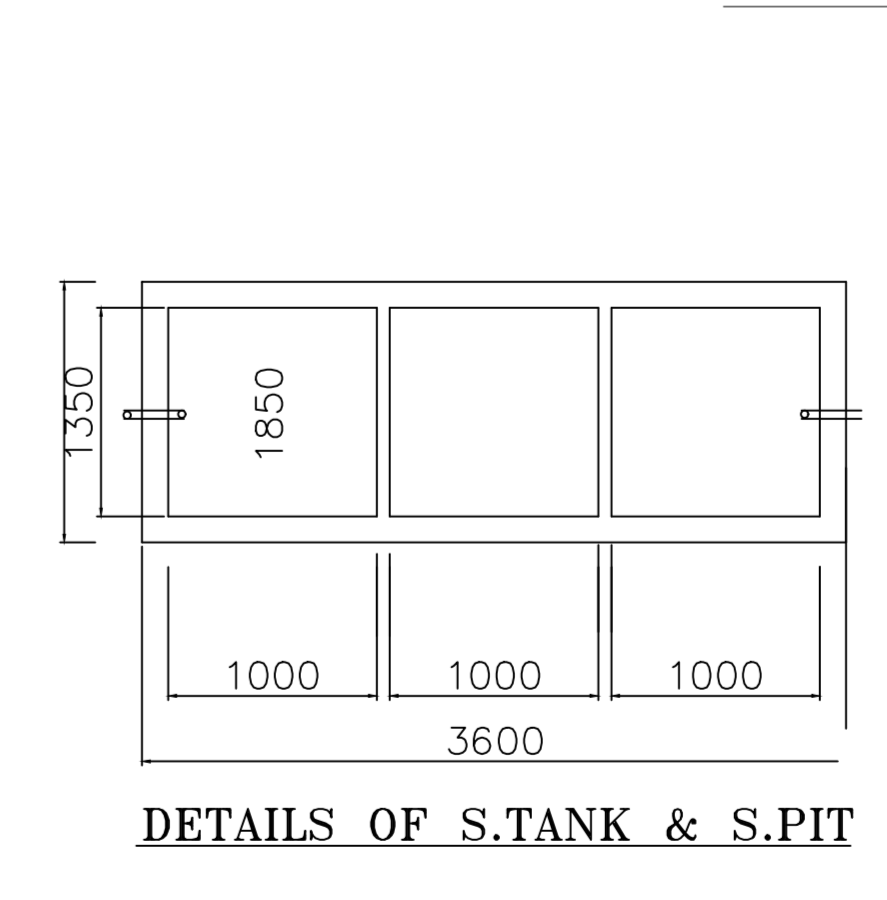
DETAIL OF GROUND WATER RECHARGEING PIT WITH SLIT TANK
